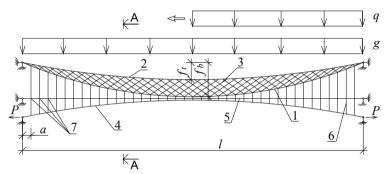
Design scheme of prestressed suspension structure: 1 – bottom chord; 2 – top chord; 3 – web elements; 4 – stabilization cable; 5 – deck; 6 – suspensions; 7 – point of load application; q – imposed load; g – dead load; P – prestressing; f_b – bottom chord camber; f_t – top chord camber; l – main span; b – width; a – suspension step
